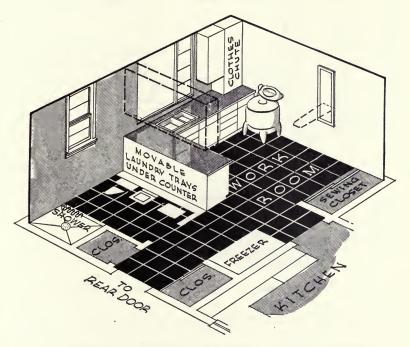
Farmhouse workroom for laundry, work space, and equipment; also wash-up room and closet for work clothes.
